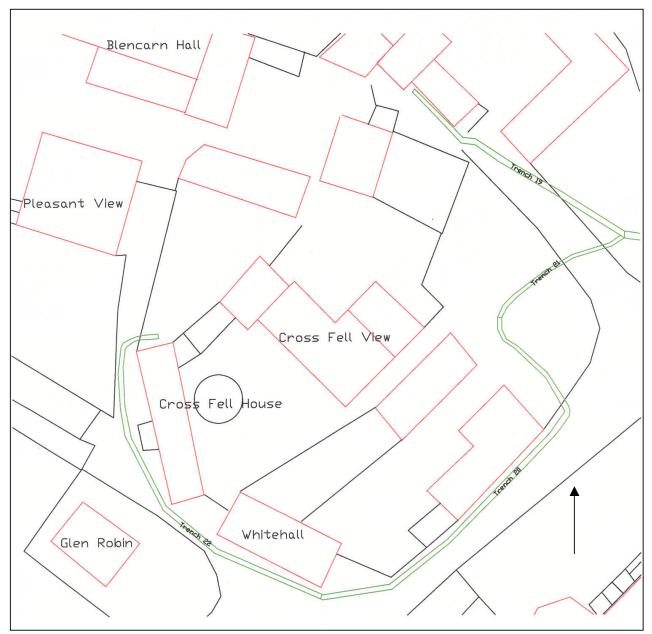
Trench Location Plan North-West corner of the village, showing trenches 19-22. Scale 1:500 @A4
